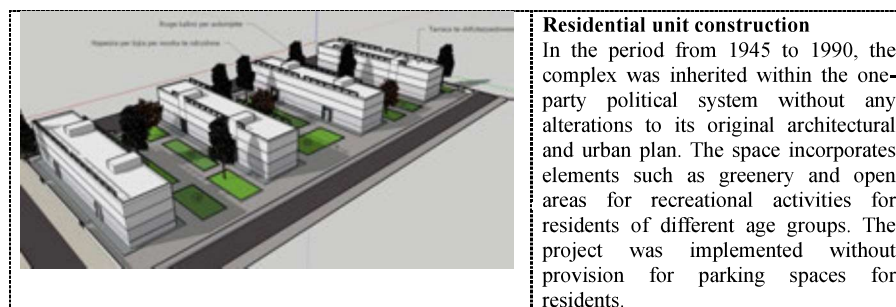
3D view of the residential unit after construction. Source: author drawings based on plans from AQTN, Tirana.
